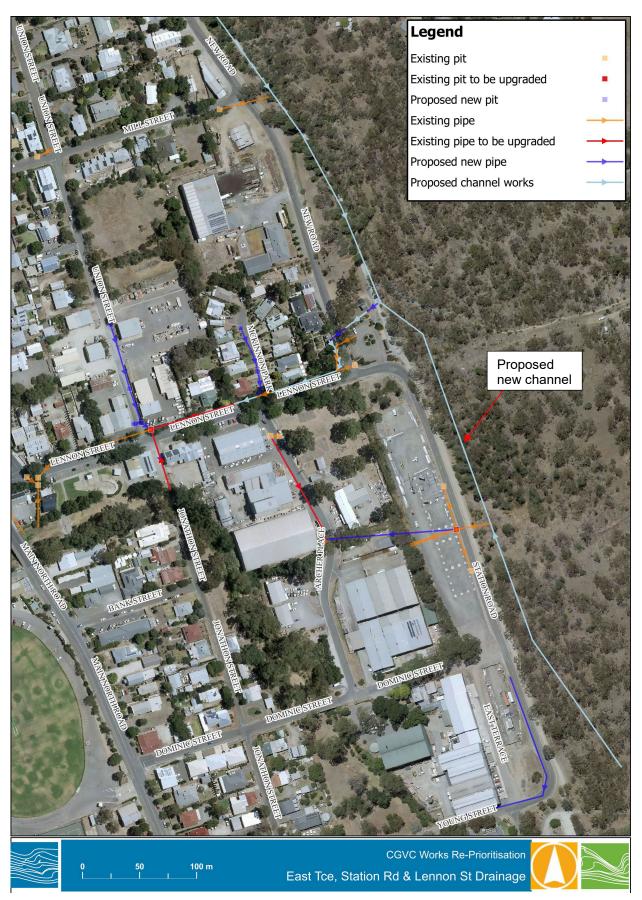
East Tce, Station Rd and Lennon St drainage upgrade schematisation (overview)
